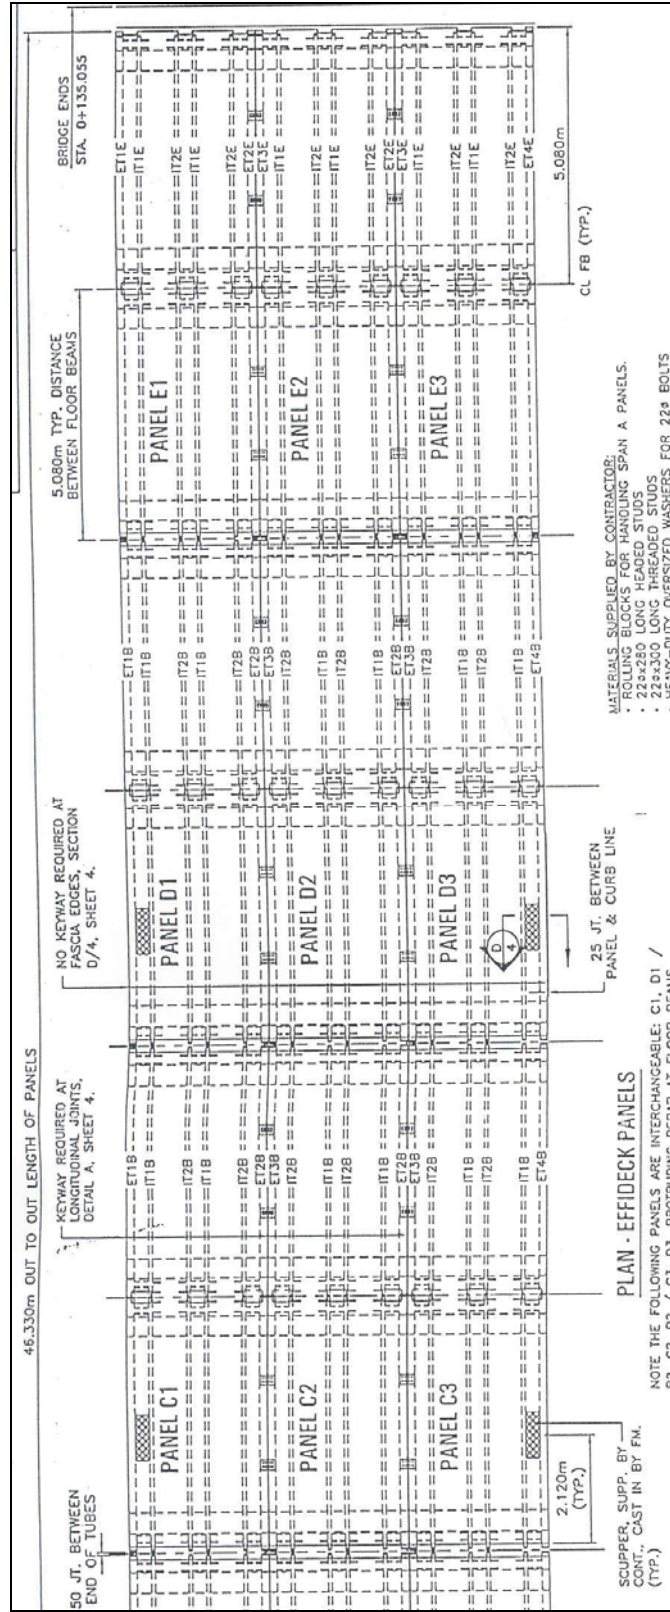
Deck plan view of bridge over Cascadilla Creek, Ithaca, NY (The Fort Miller Co., Inc., 2001)
